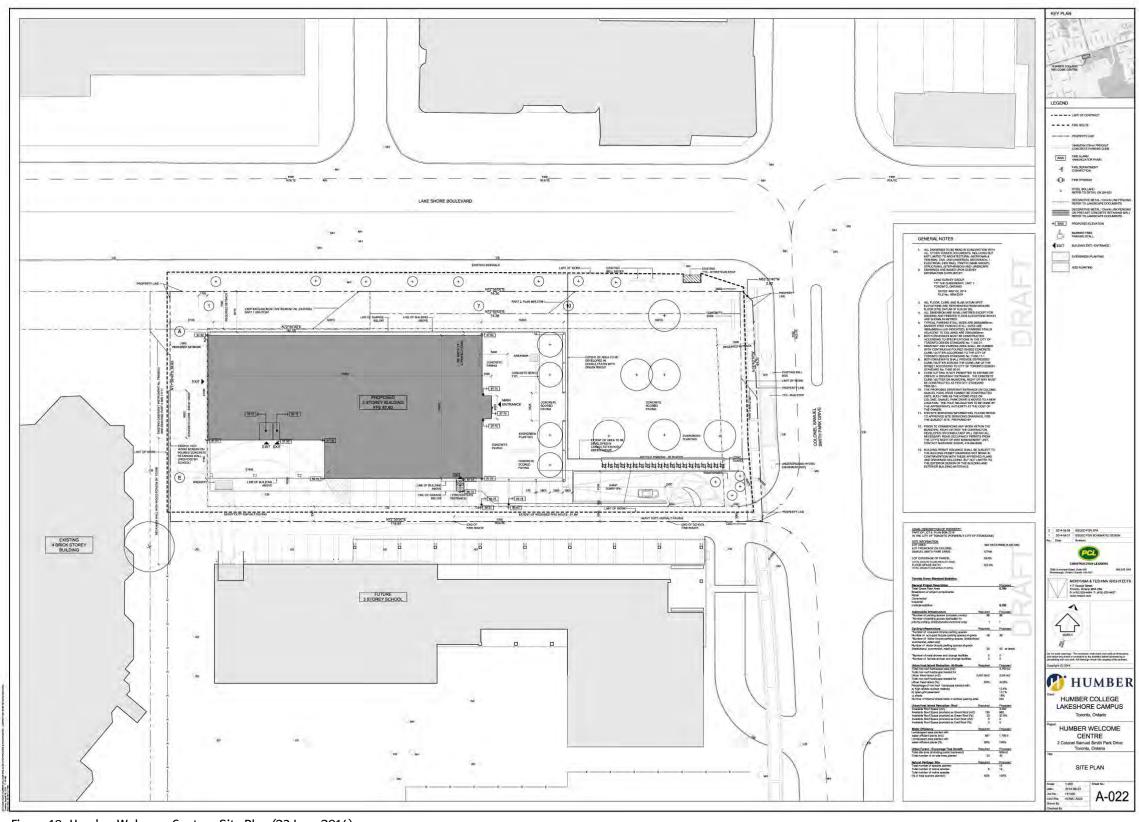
Humber Welcome Centre - Site Plan (23 June 2014)
